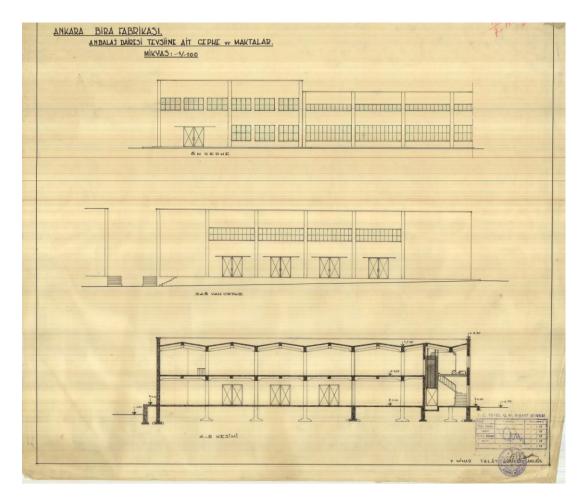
Drawing of the addition in the beer filling building, elevations and section, Talat Güreli, master architect worked in the Construction Section in General Directorate of TEKEL (Source: TTA Archive)
